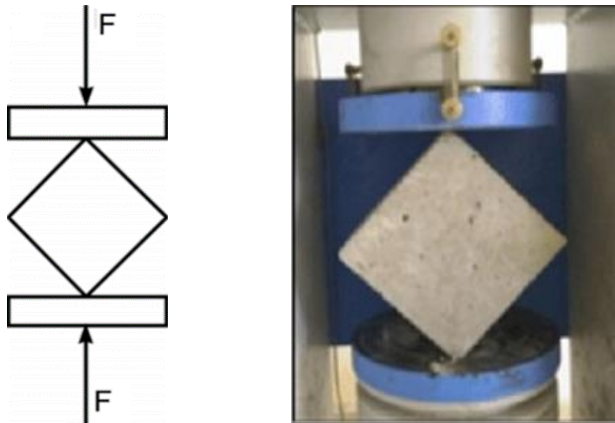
Loading ECC cube specimen on the testing machine for split tensile strength test.
